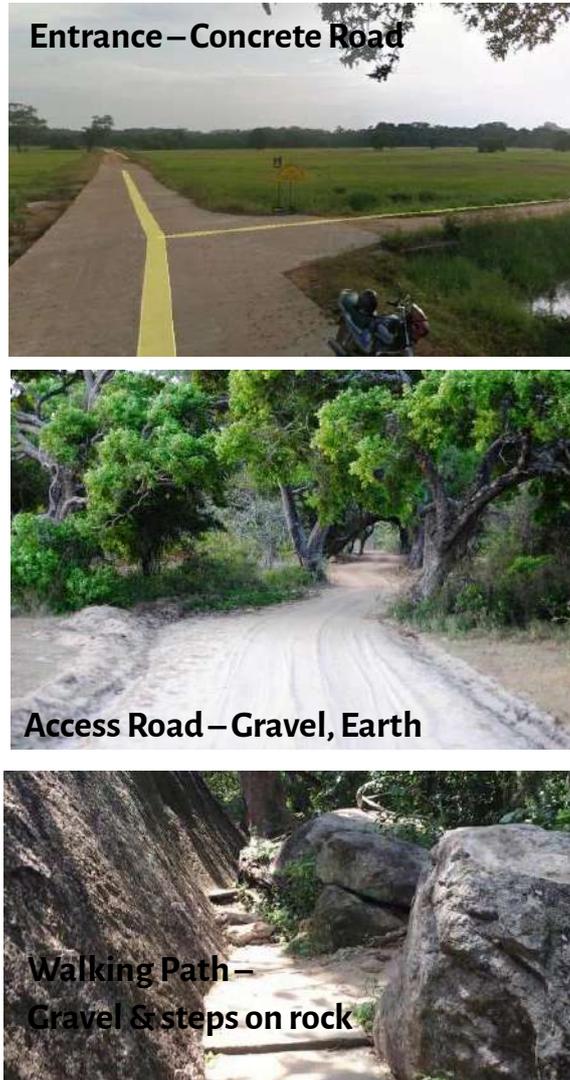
Existing condition of Kudumbigala Monastery Access Road
